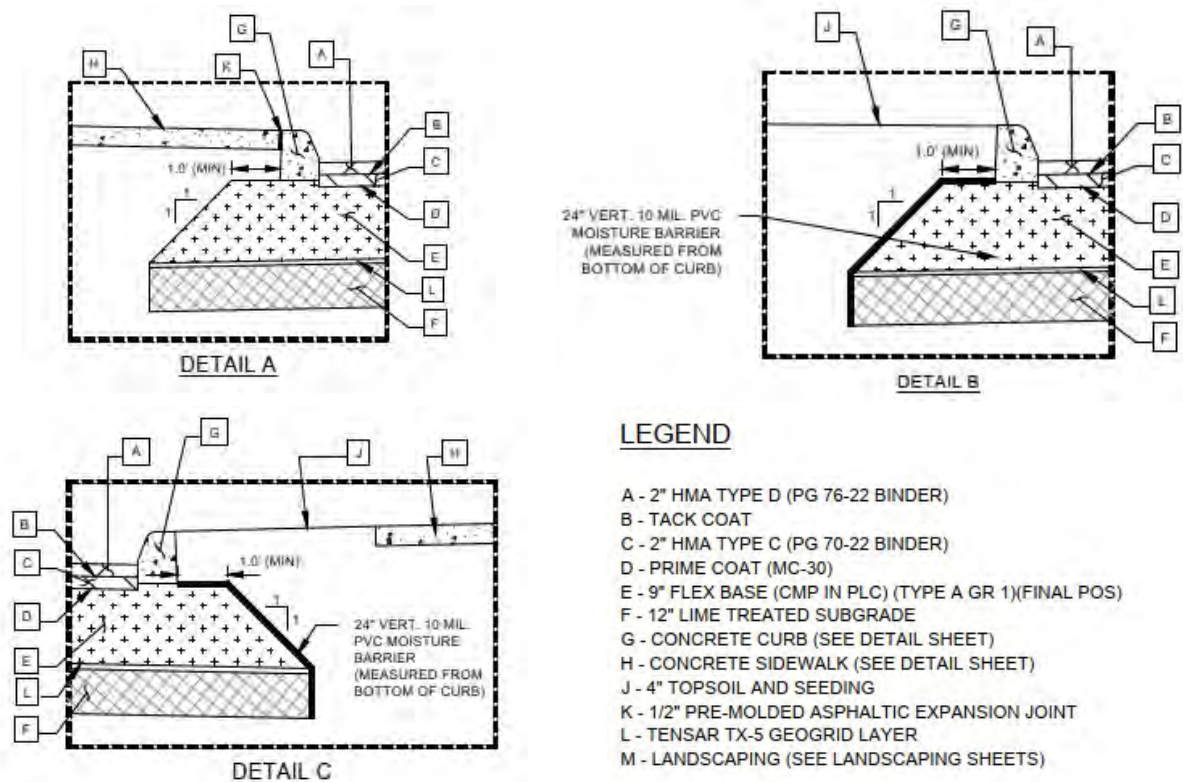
Pavement Cross Section – Plan Sheet No. 34
